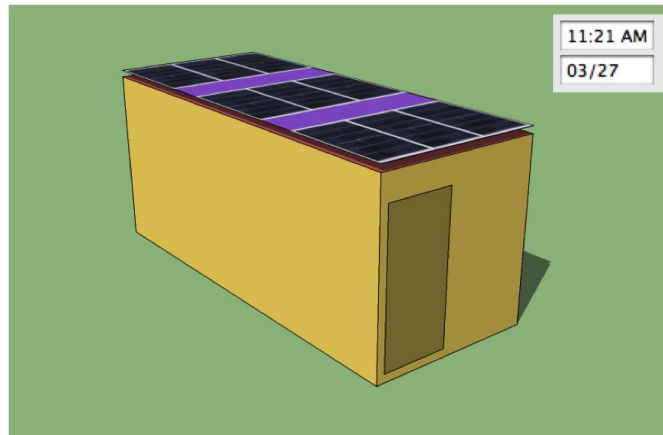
SketchUp container model with nine photovoltaic panels mounted on top of the roof
